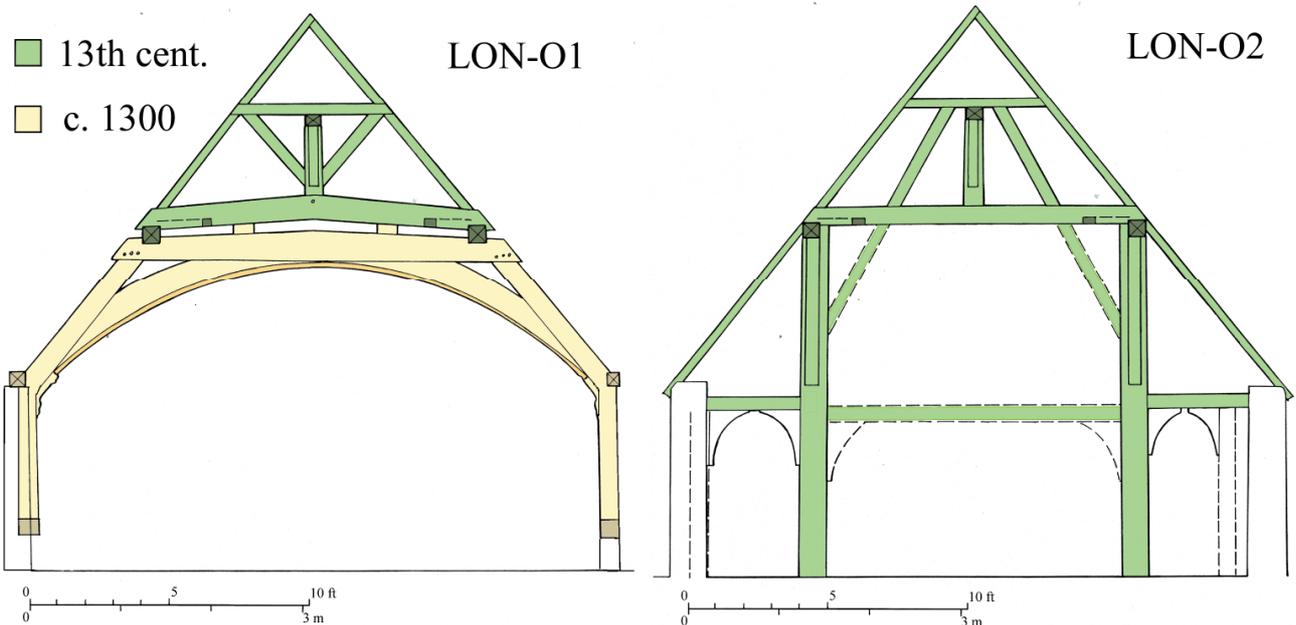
Sections of trusses T1 and T2. Redrawn from Bailey, 1994.
